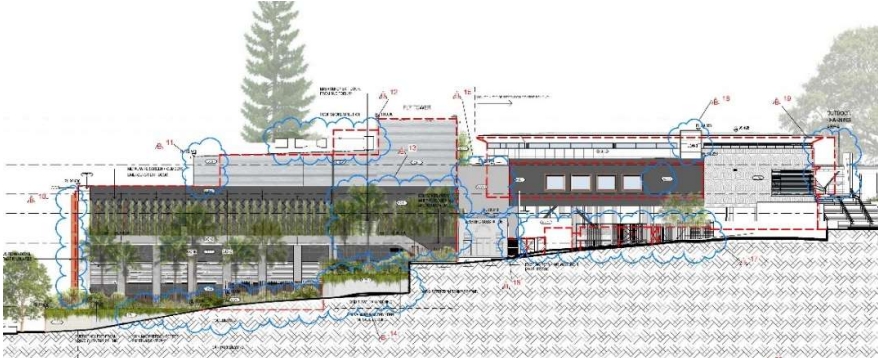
Proposed Southern Elevation. Modifications clouded in blue. Source: PD Mayoh Architects
